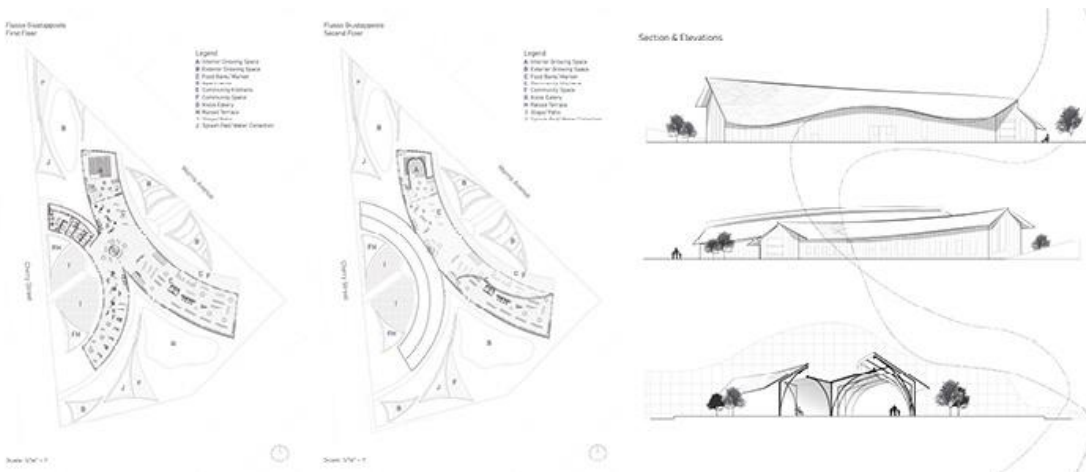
Floor Plans (left), Elevations, and Section (right) of "Juxtaposed Flows." Source: (Author 2023)
